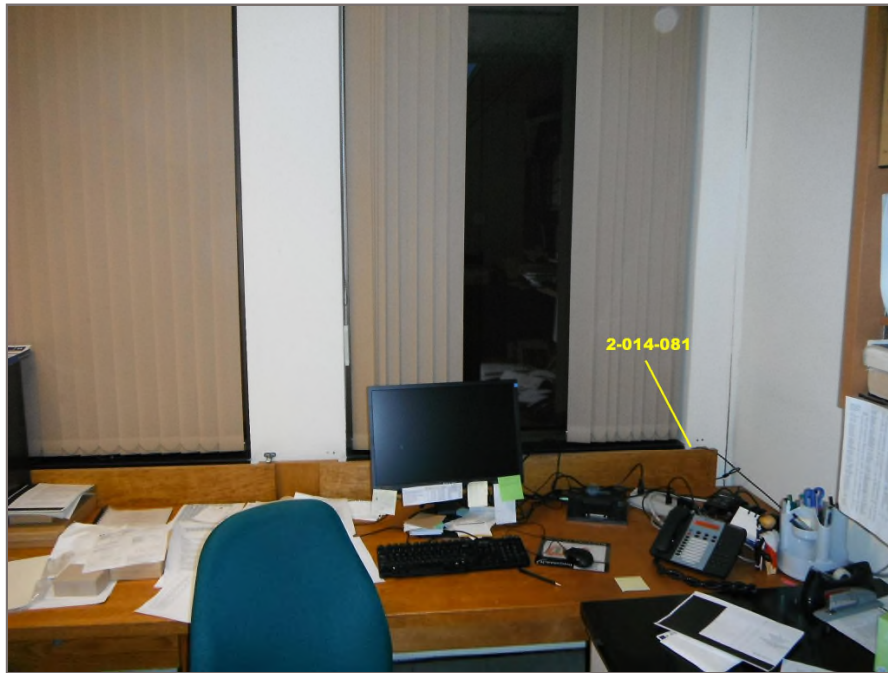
Asbestos-containing drywall joint compound applied to the interior wall of a second floor office. Tetra Tech sample 2-014-081.
